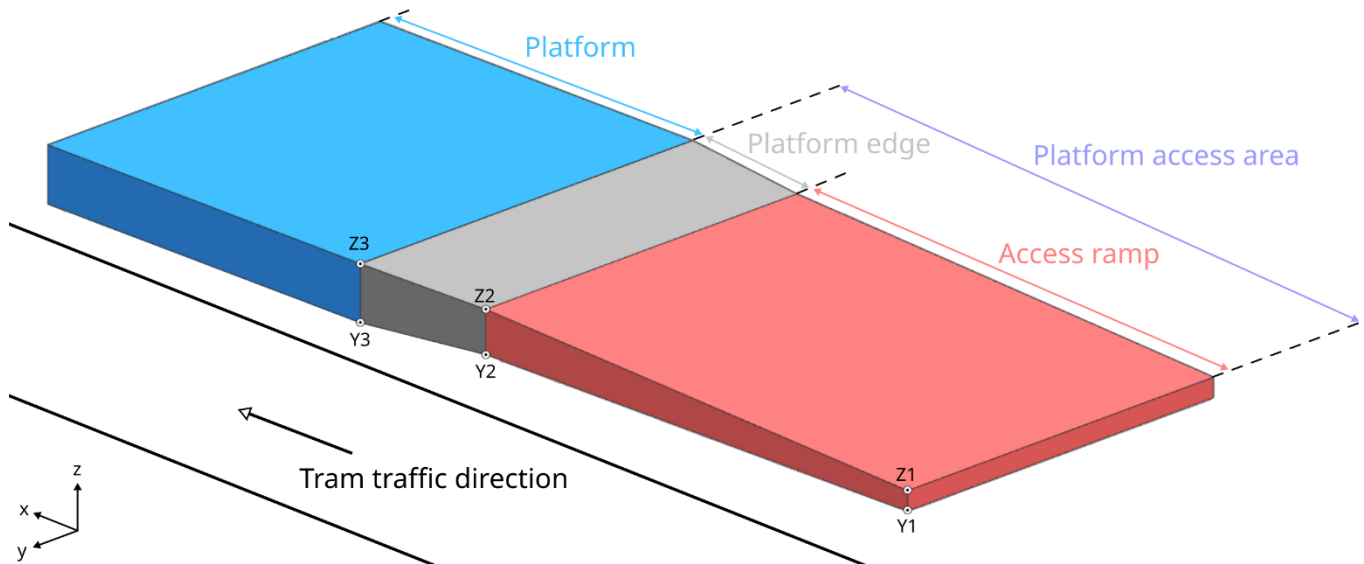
Platform access area in longitudinal view from the track (along the Oxz plane), with an example of two geometrical connections (Platform / Platform edge and Platform edge/ Access ramp)
